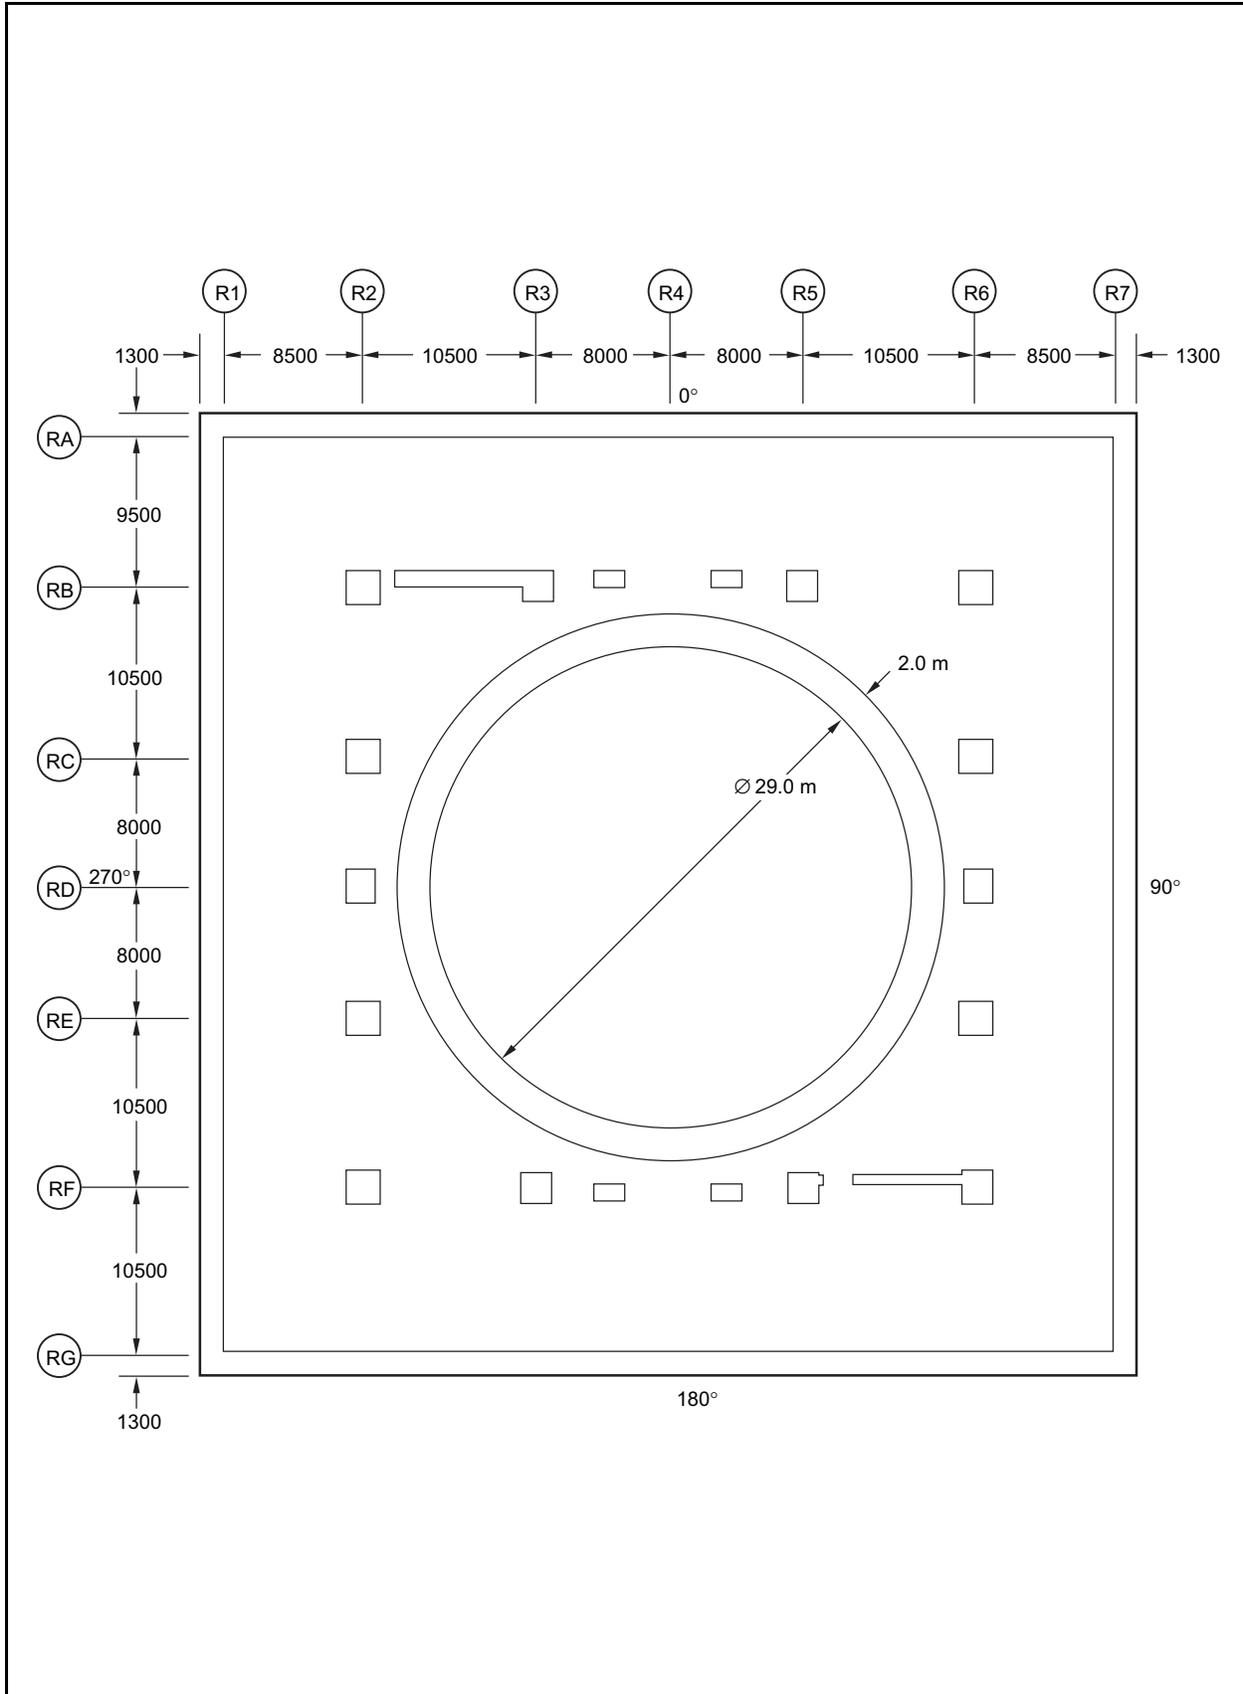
Reactor Building Arrangement Floor B2F Elevation -1700 mm
